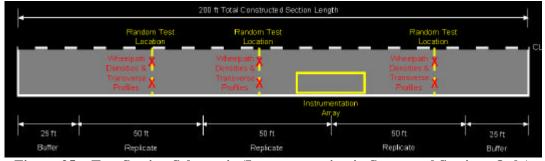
Test Section Schematic (Instrumentation in Structural Sections Only)
